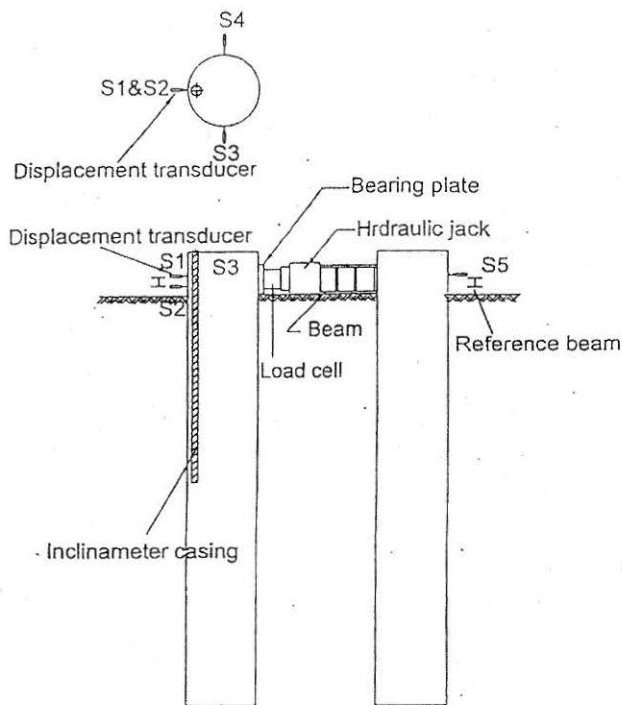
Typical Arrangement for Lateral Load Test and Instrumentation
